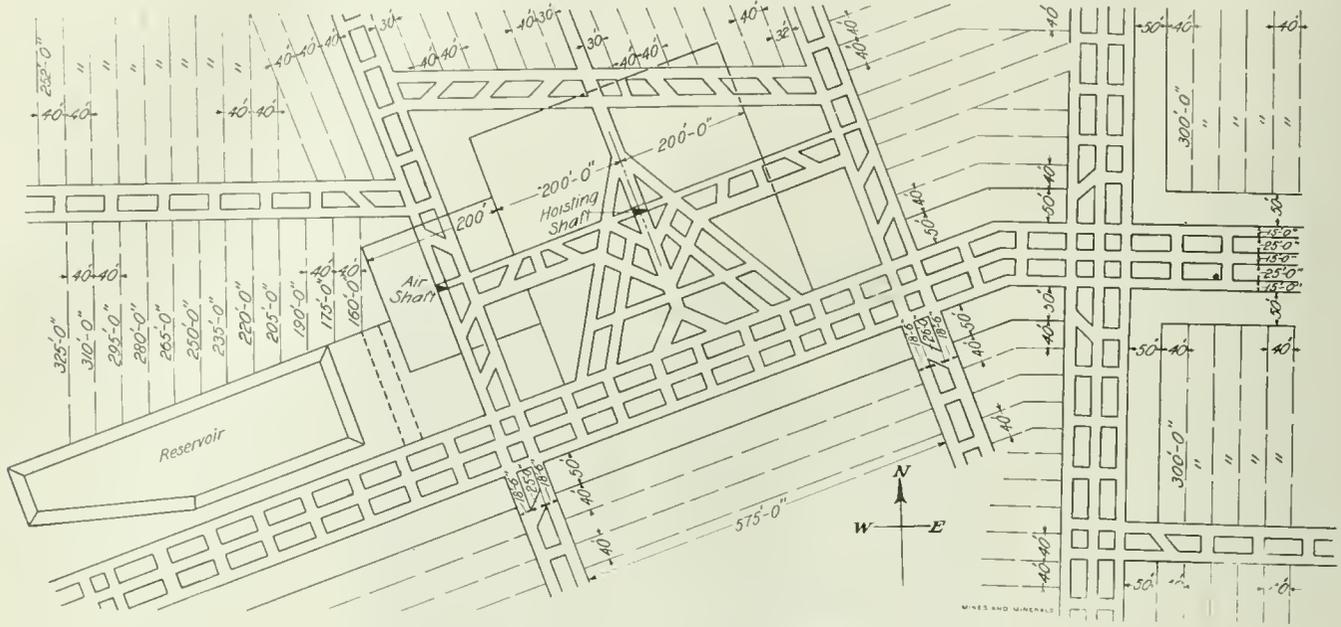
DEVELOPMENT PLAN, MINE NO. 3, SALINE COUNTY COAL CO.
